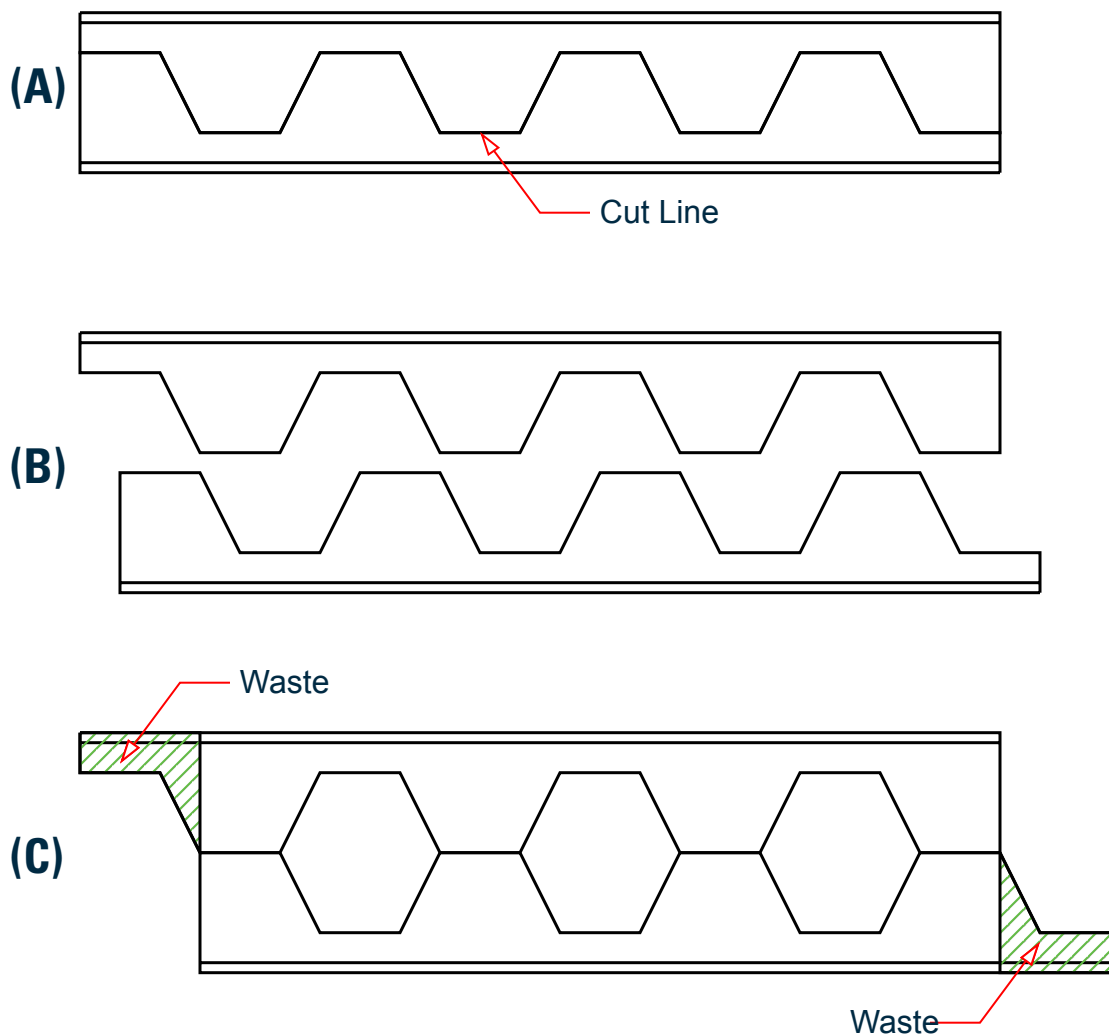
Manufacturing process for castellated beams: A) Cut hexagonal line, B) Stagger top and bottom sections, and C) discard waste at ends
